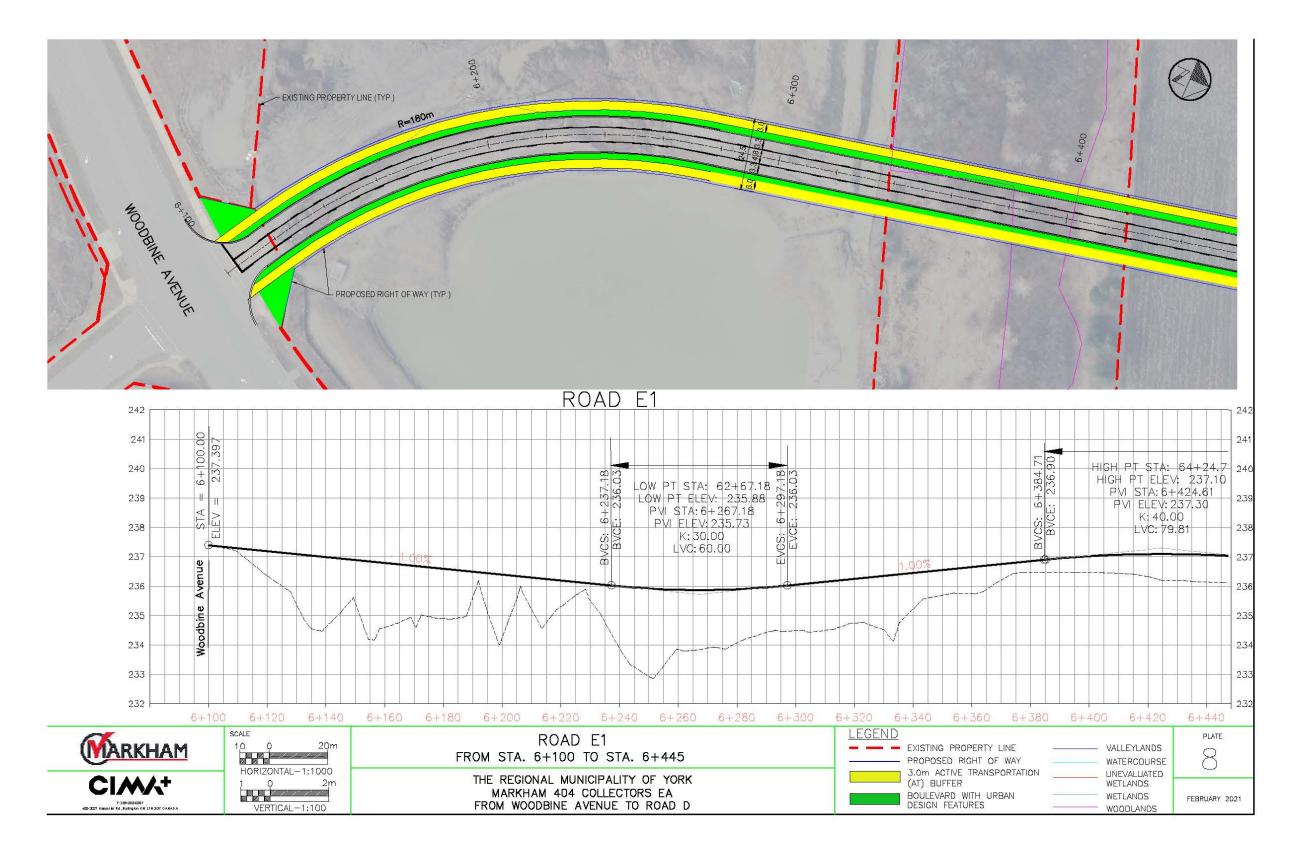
Preliminary Design Plate Road E1 Station 6+100 to Station 6+445
